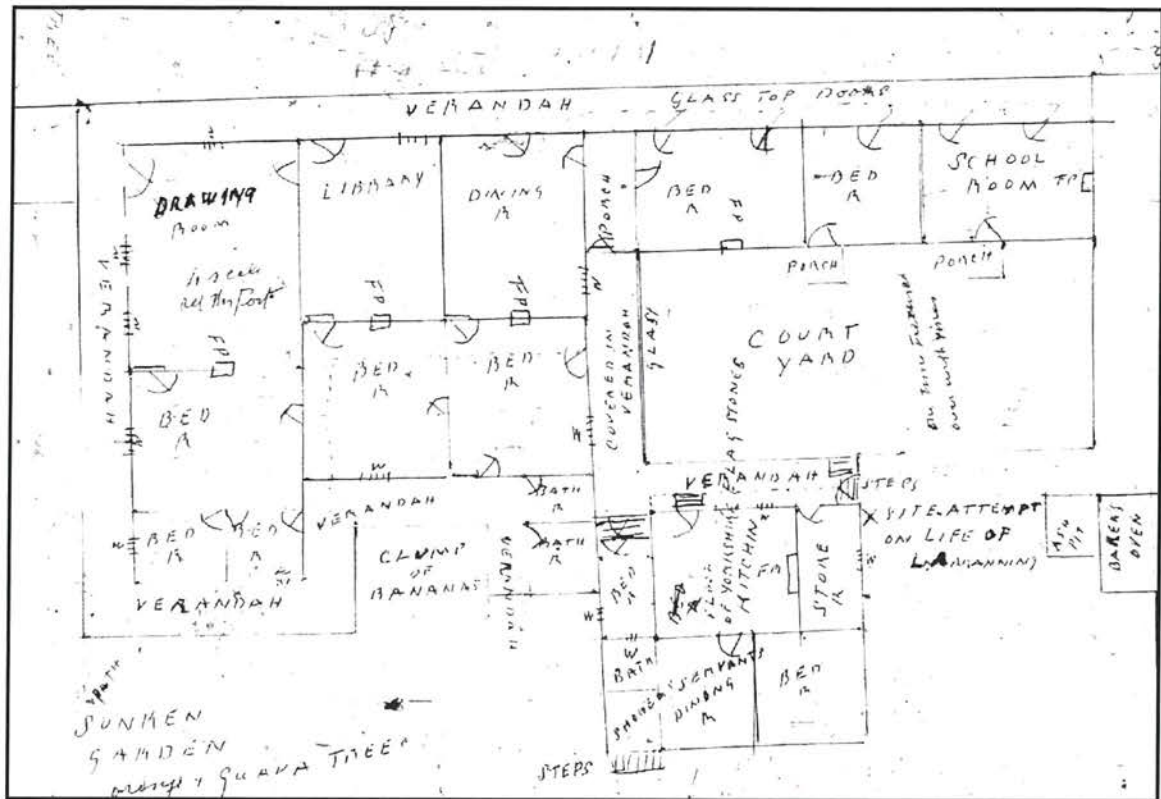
Detail of L.C. Manning's Plan showing layout of the homestead (Courtesy Battye Library)
